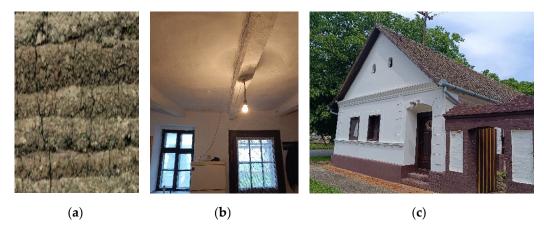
Photos of a house constructed from rammed earth. (a) A close-up of a rammed earth wall; (b) a close-up of the ceiling featuring wooden beams; (c) an image showcasing the facade of the rammed earth house.
